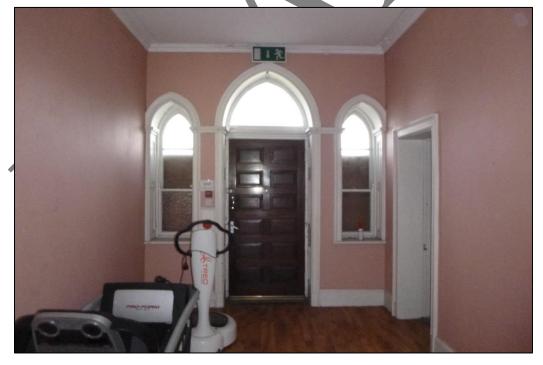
Interior view of original front entry door and sidelights with original timber windows from hall (18.02.2025).
